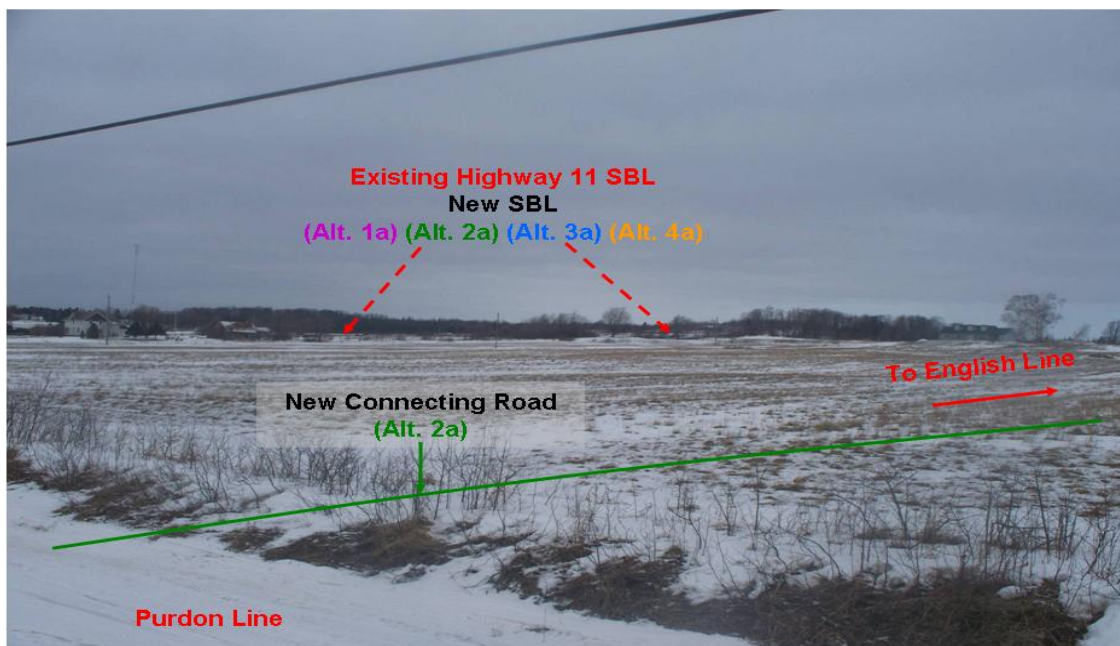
View looking north from east side of Highway 11 NBL at about Station 21+020 (House No. 1942). (February 21, 2008)
